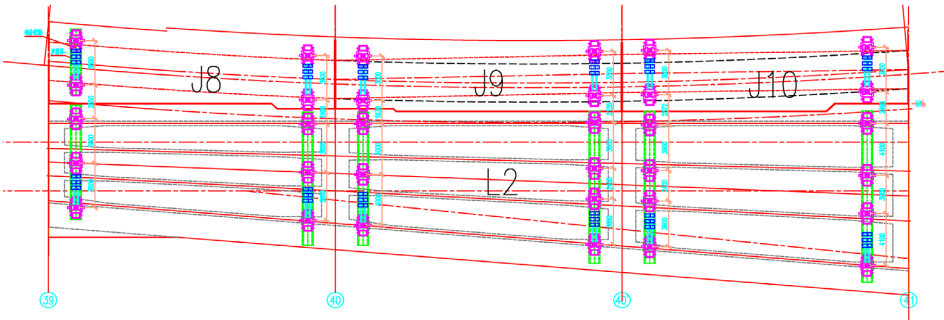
Layout of the new beam L2 and J8-J10 rail clamping equipment
